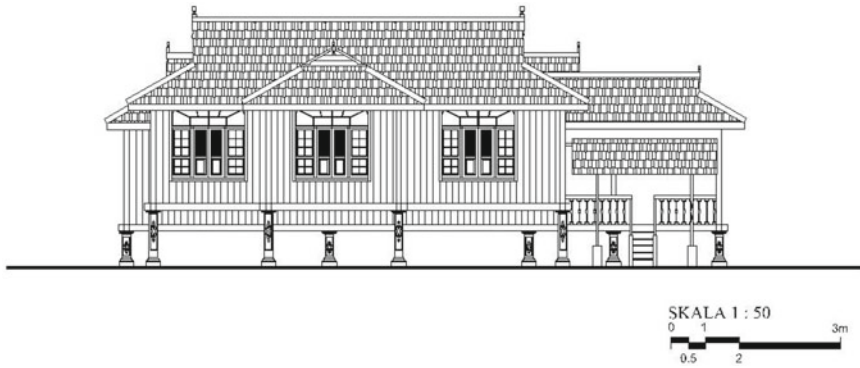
Front elevation of Daeng Haddadek house. *Source* Centre for the study of built environment in the Malay world (KALAM)
